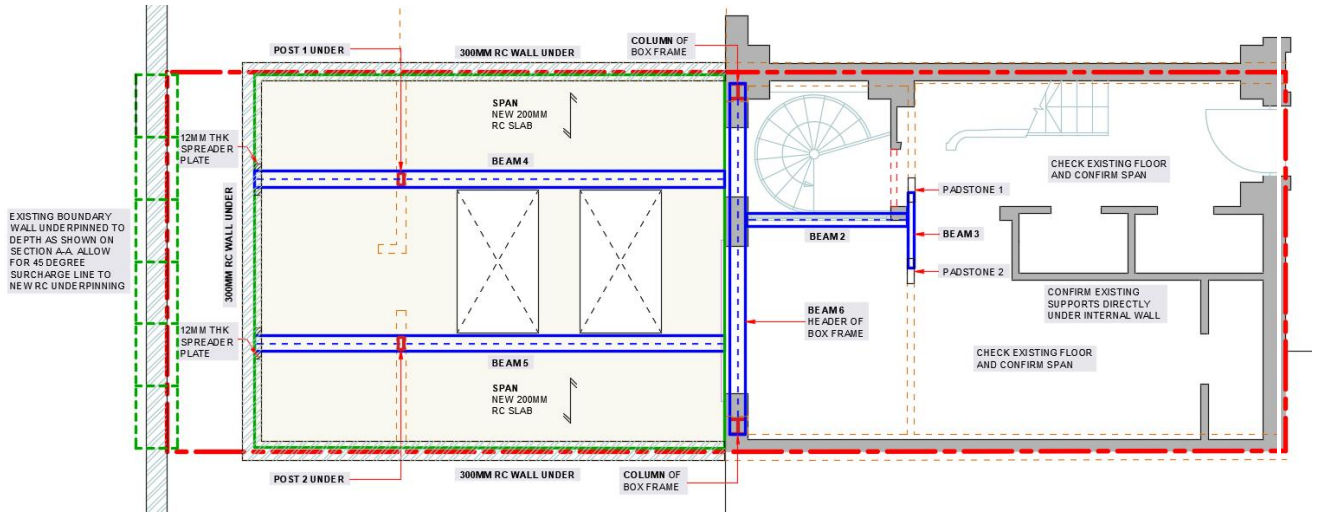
PROPOSED GROUND FLOOR/GARDEN TERRACE LEVEL
